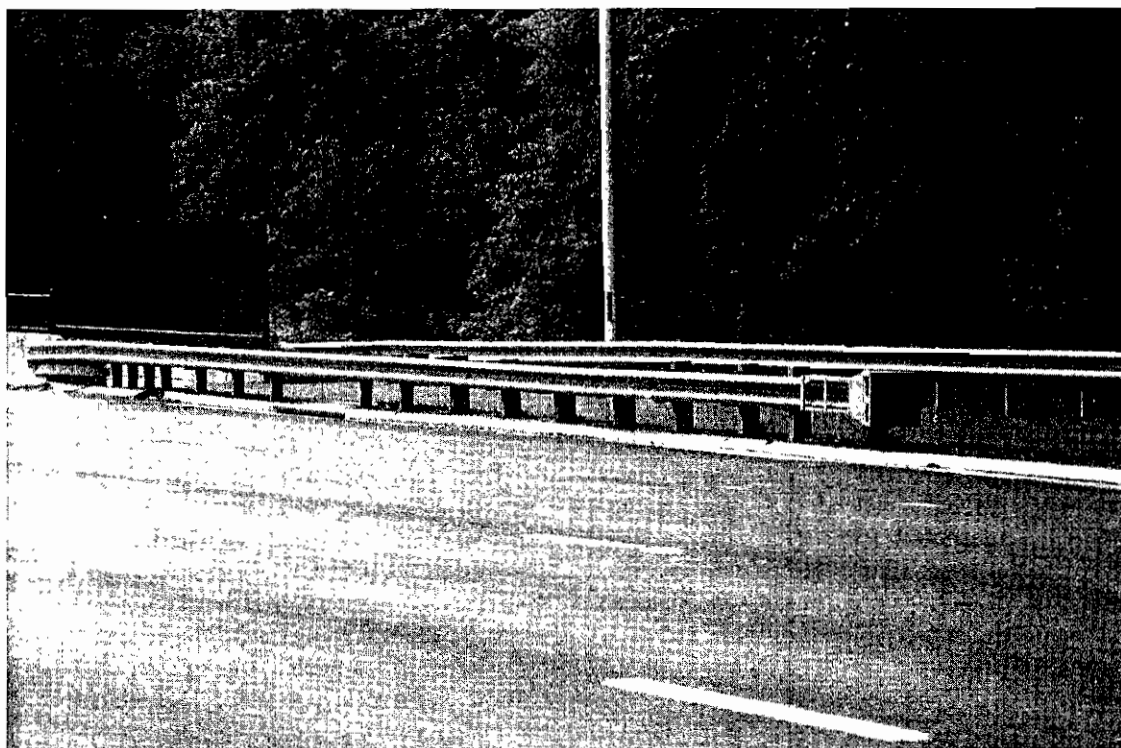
Terminating traffic barrier on bridge with end terminal
